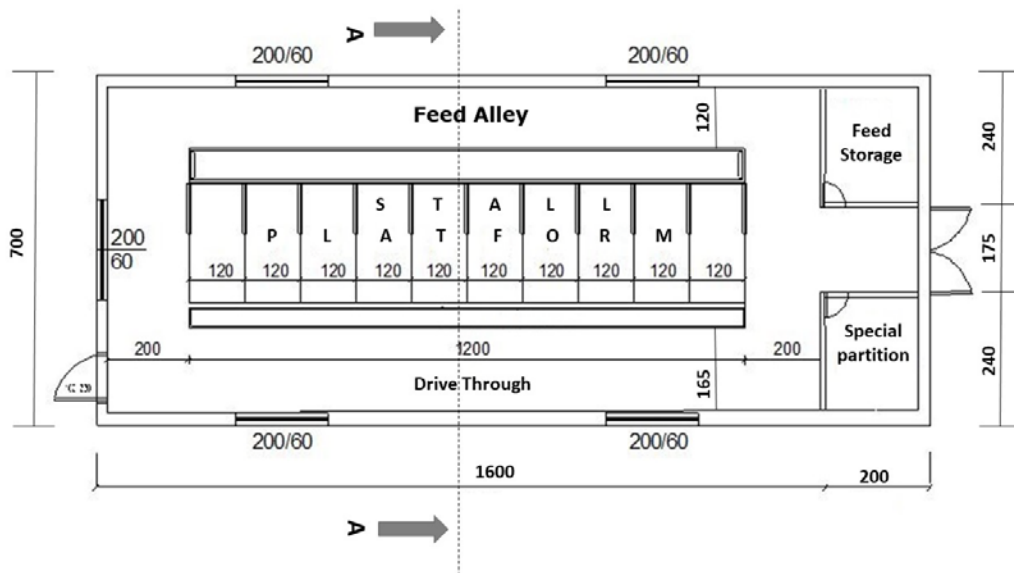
The floor plan of 10-headed prefabricated barn with lightweight concrete
